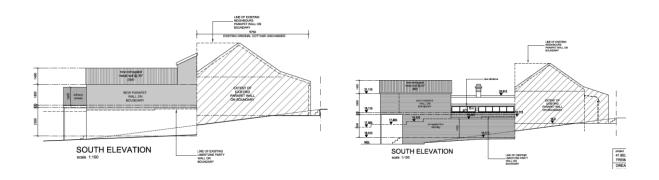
South elevation of Refused development (Left) and Deferred Plans (Right).
